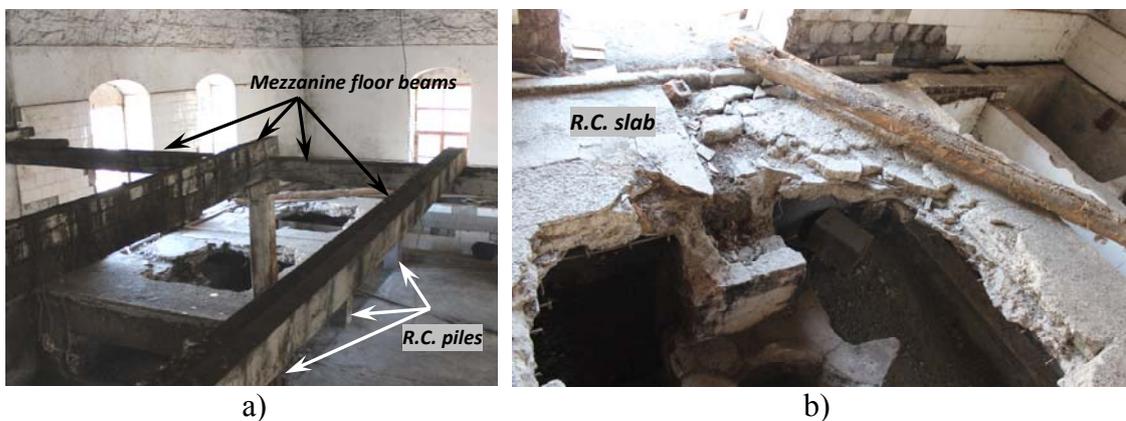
a) An overview reinforced concrete platform for two hydraulic presses from mezzanine floor, b) a close view of the reinforced concrete slab and a supporting brick pile
